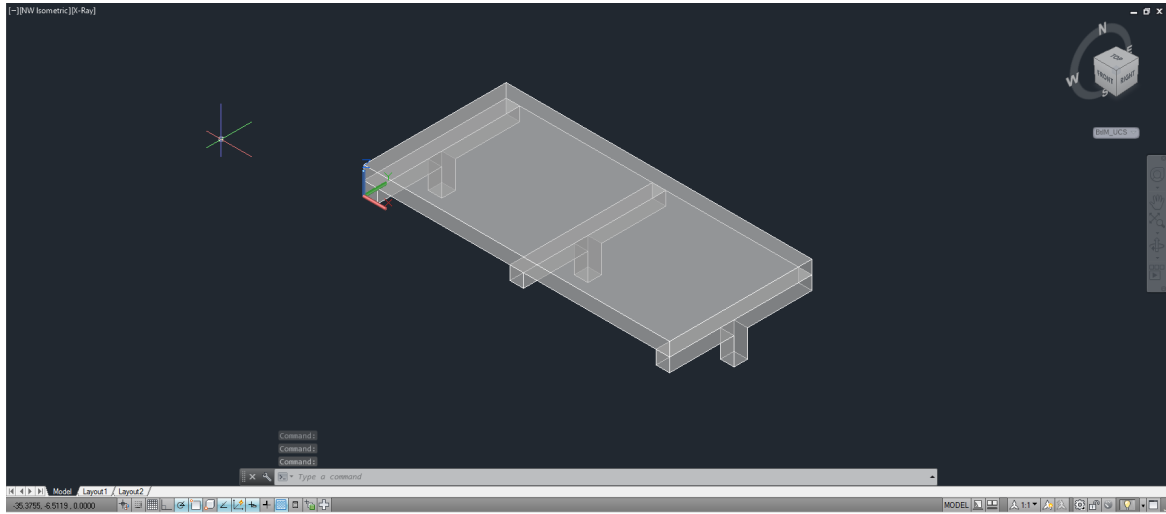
3D Model of Selected Bridge Type (Beam/Girder)
